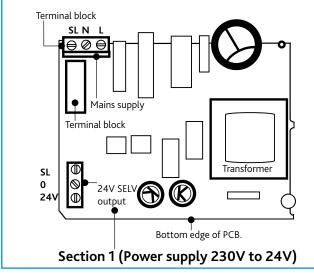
24V PCB section to be installed into transformer enclosure after completion of 24V wiring
